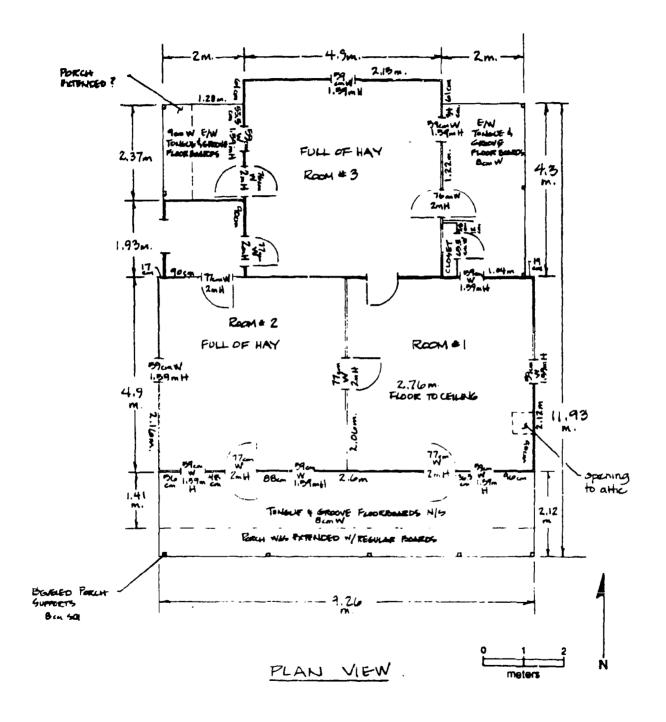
Field architectural floorplan of the dwelling at 41DN191.
